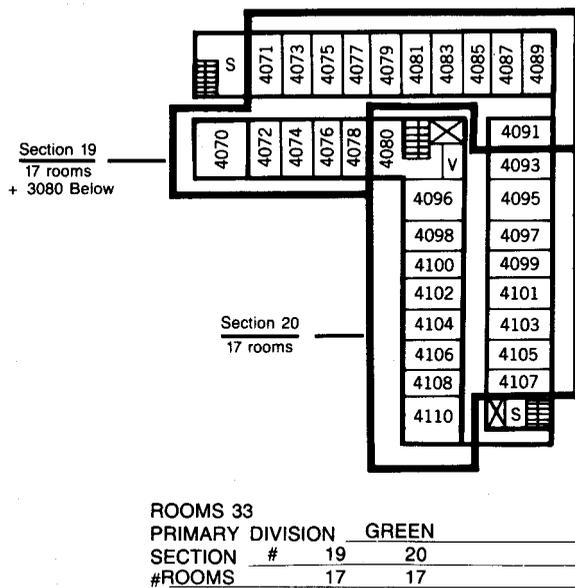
House Breakout Plan of the model hotel; fourth floor.
